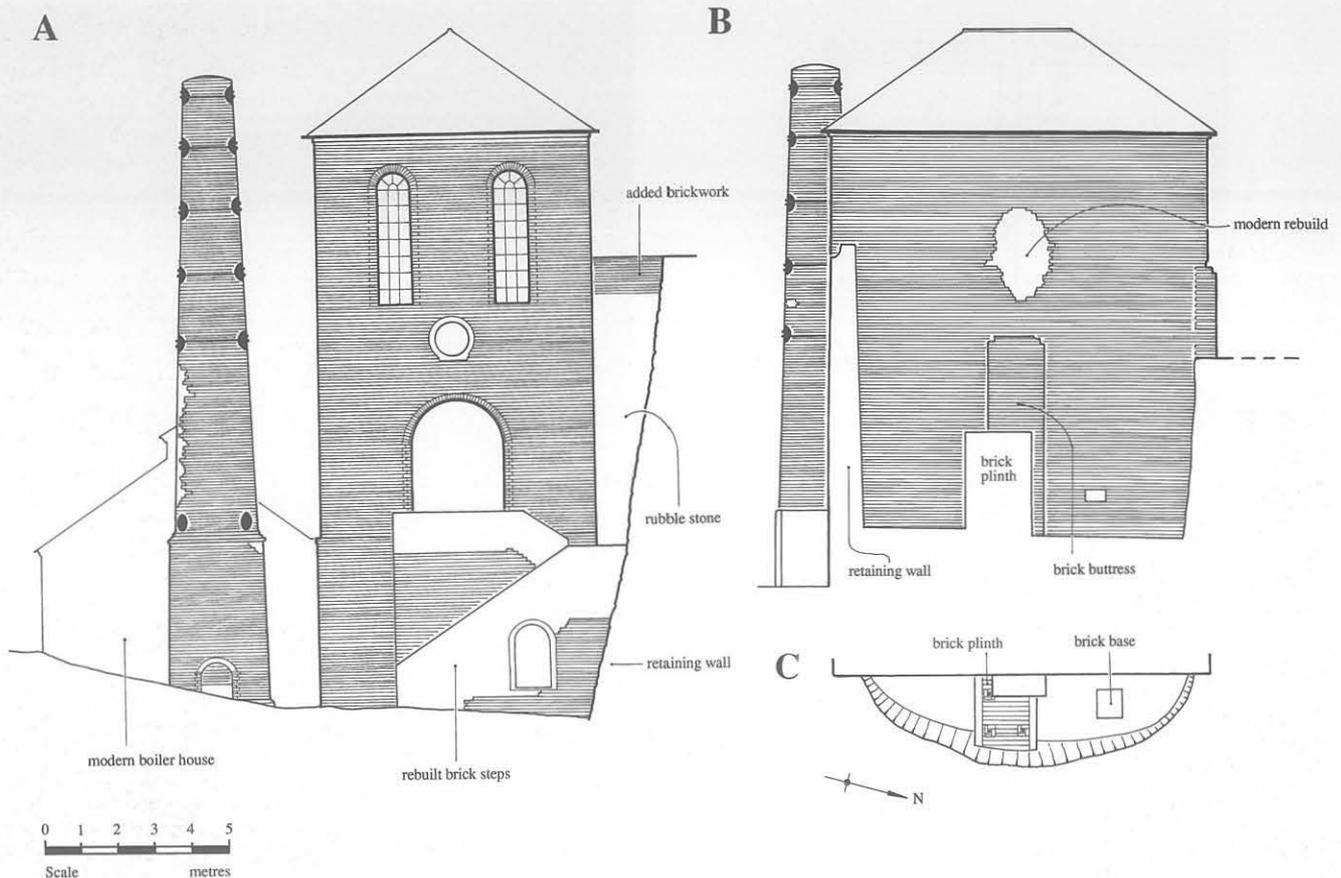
South (A) and east (B) elevations of the north engine house and stack, and plan (C) of the pit on the east side of the engine house. The south side incorporates the opening for the blast main. The pit on the east side predates the present building and its brick plinth supported the end of a charging gantry.
